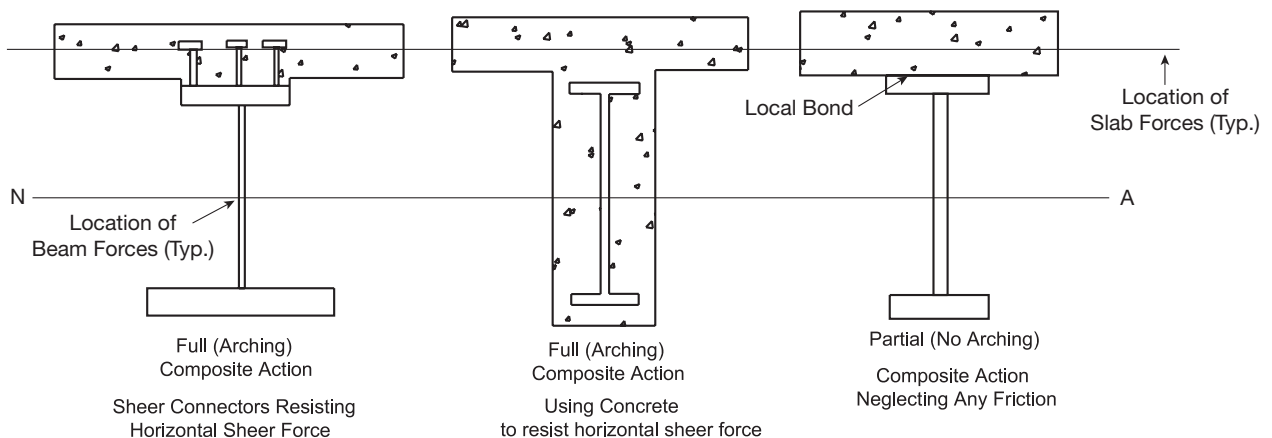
Full and partial composite action between slab and beam due to eccentric type of slab-to-beam connections.
